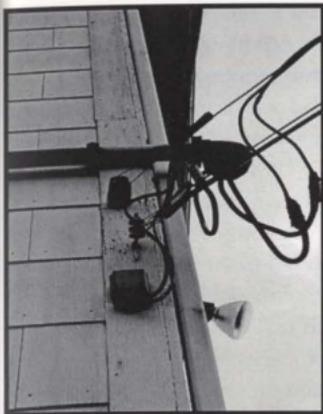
Plethora of wires which connect to the southwest corner of the western elevation.
